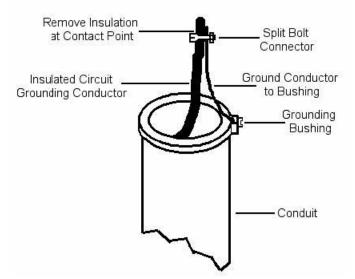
Figure I – Bonding of Conduit and Equipment Grounding Conductor
